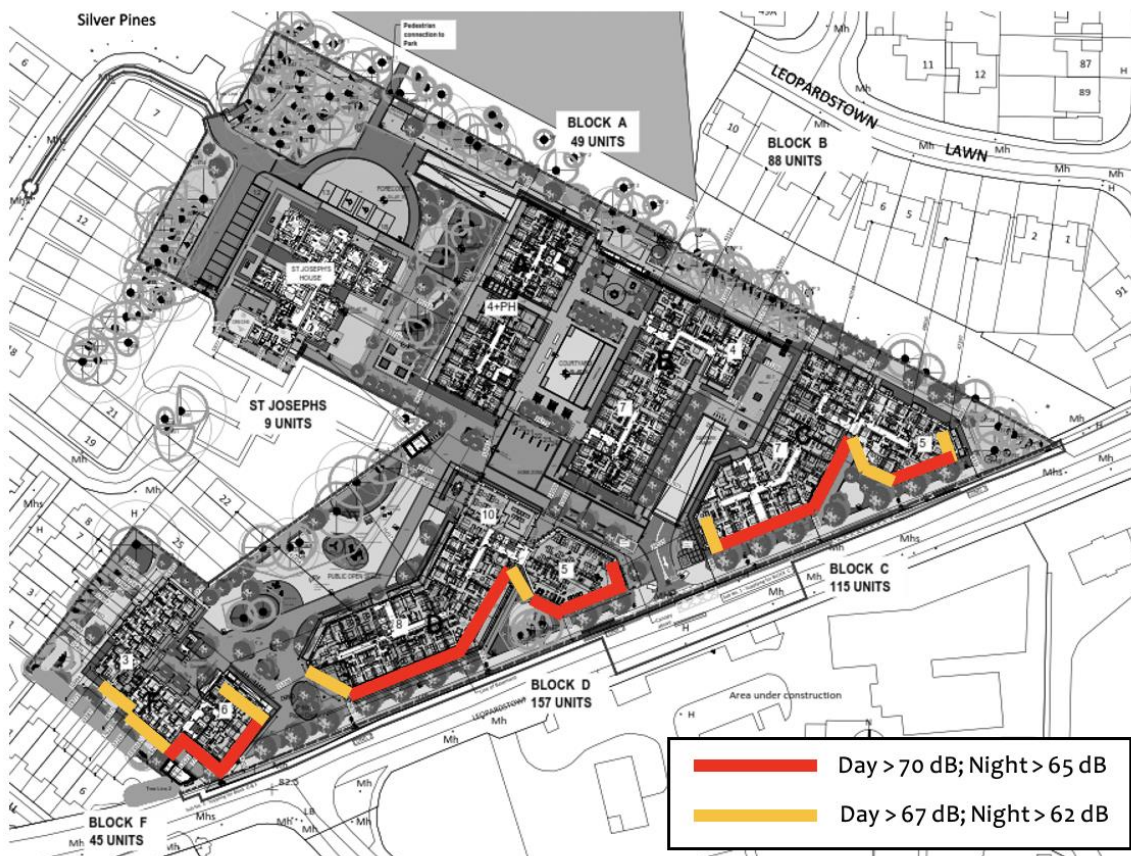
Locations for Enhanced Acoustic Façade Specification
